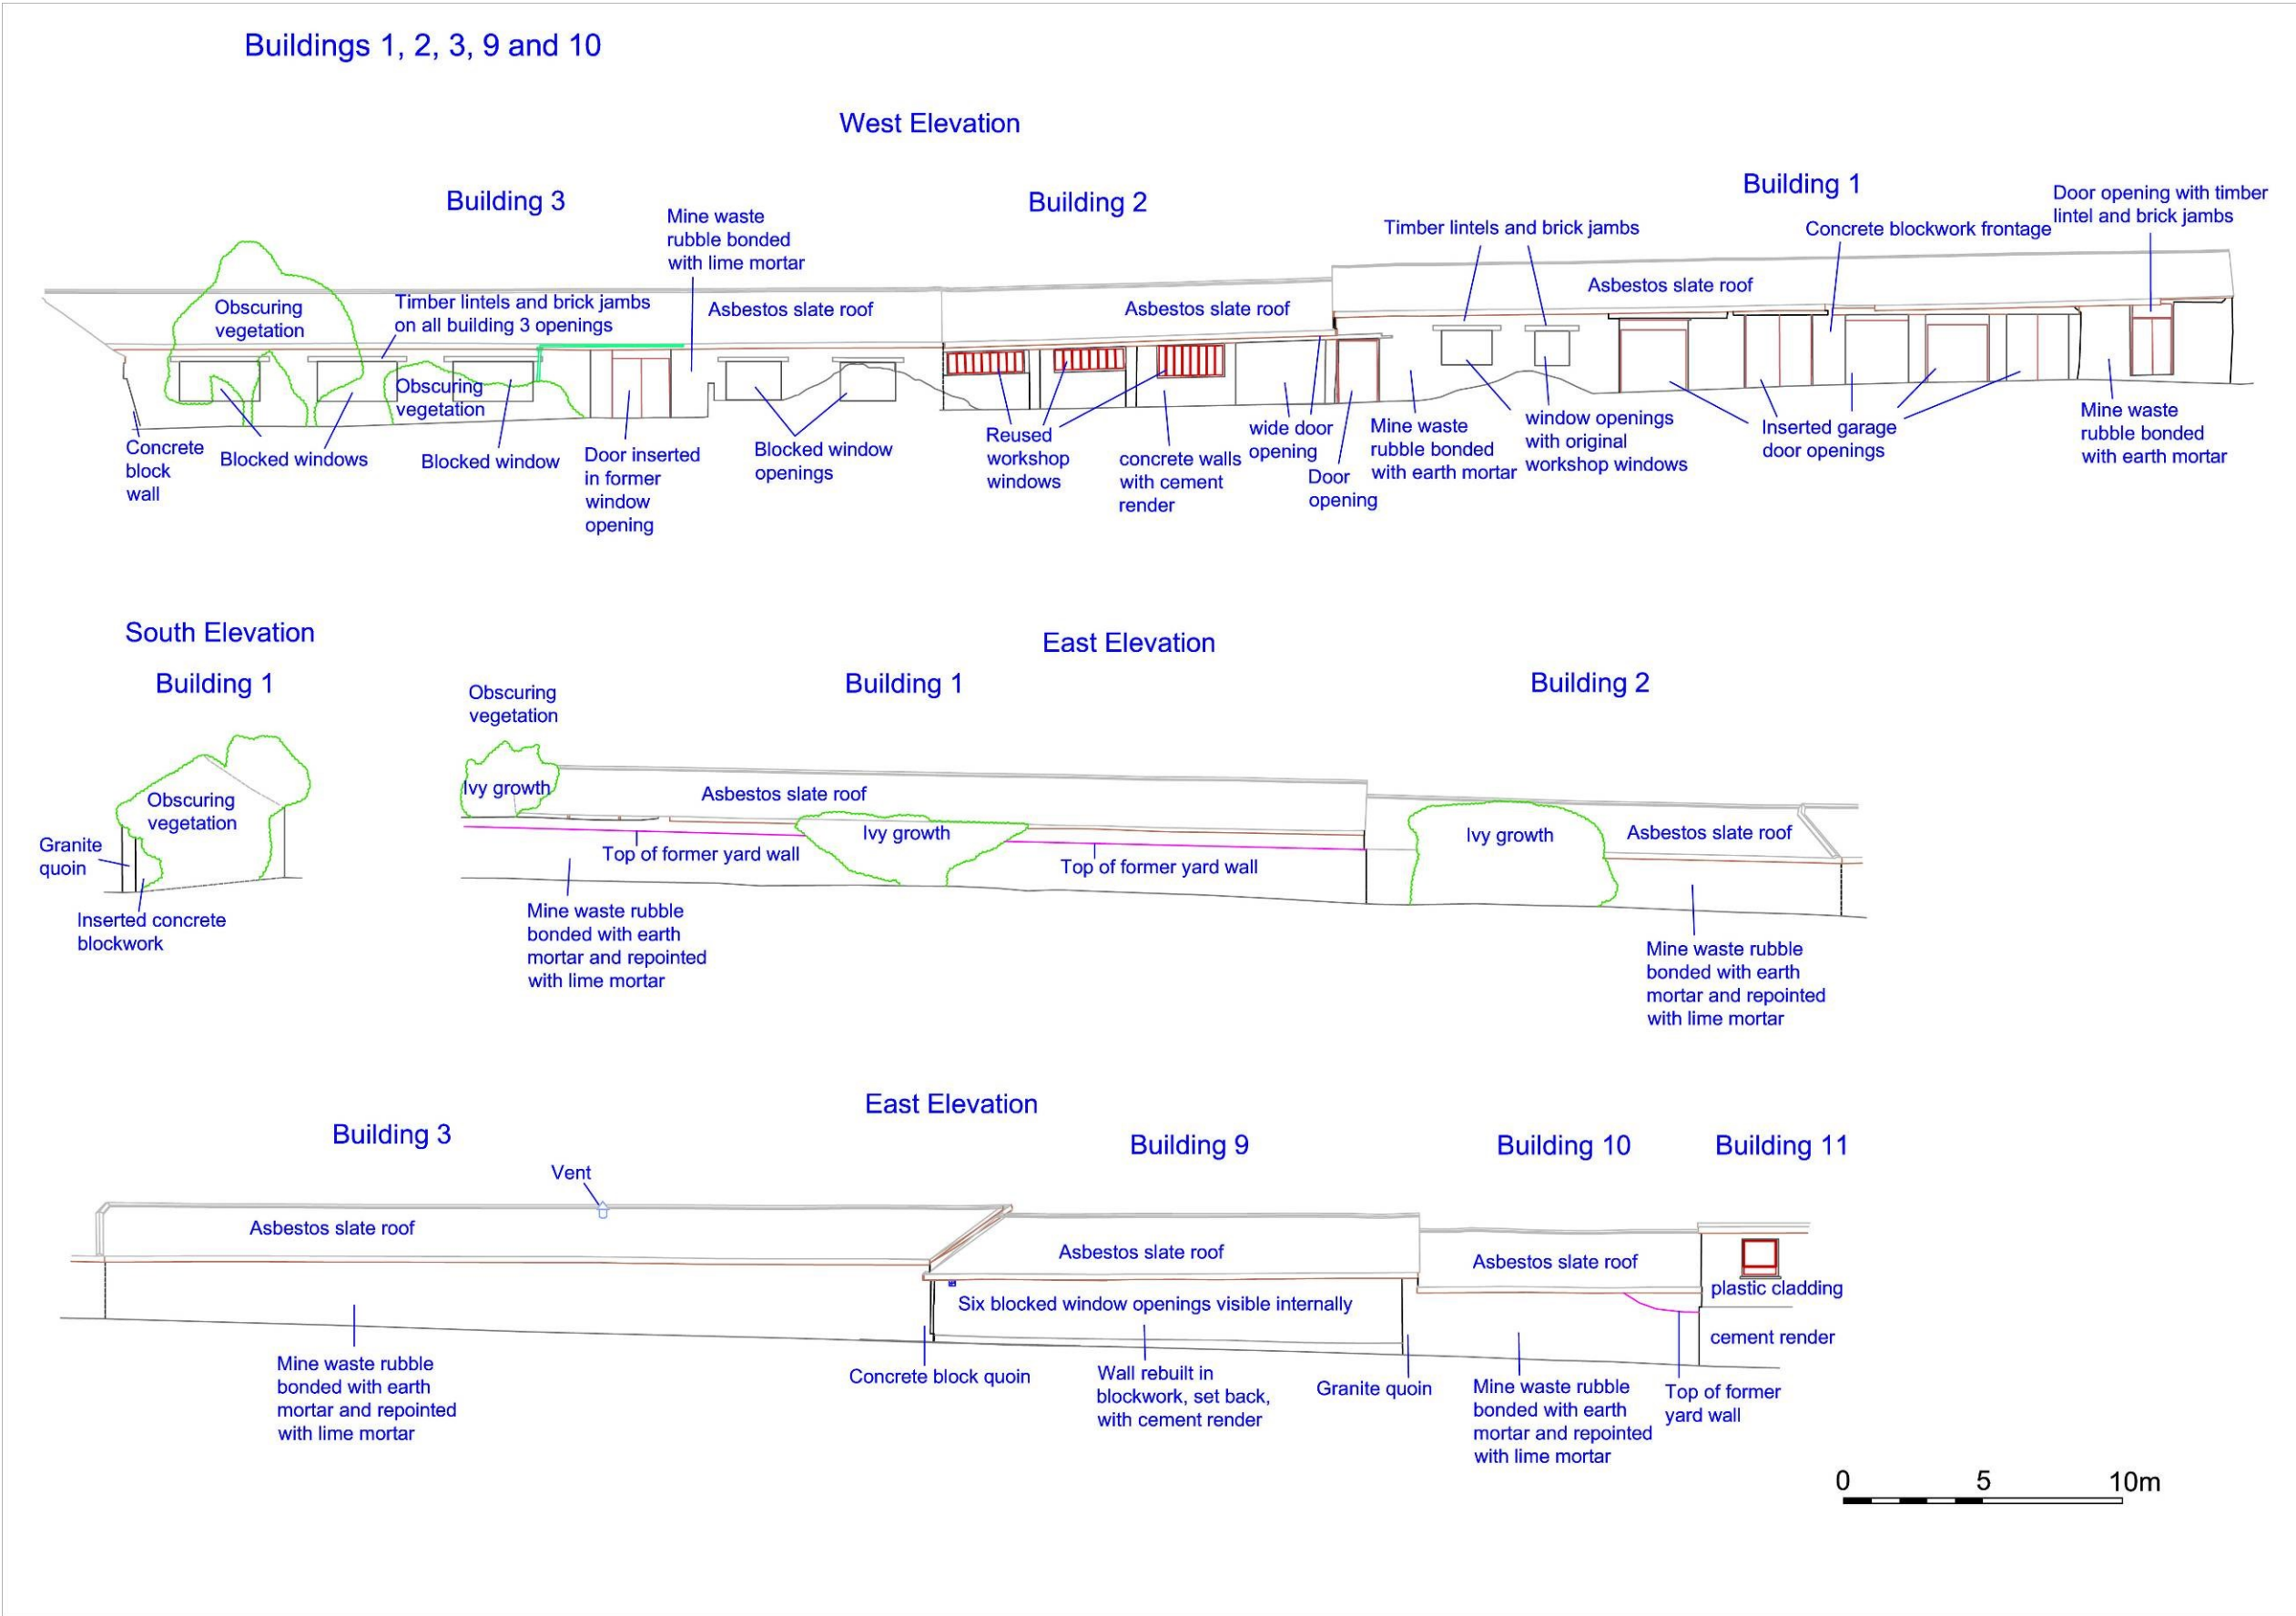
West elevations of buildings 1,2 and 3 and east elevations of buildings 1, 2, 3, 9 and 10
